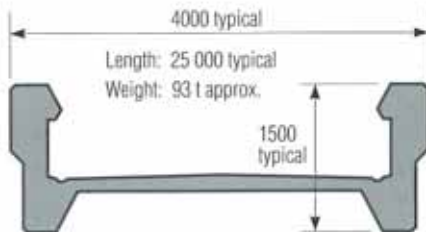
CROSS SECTION THROUGH DECK STRUCTURE
